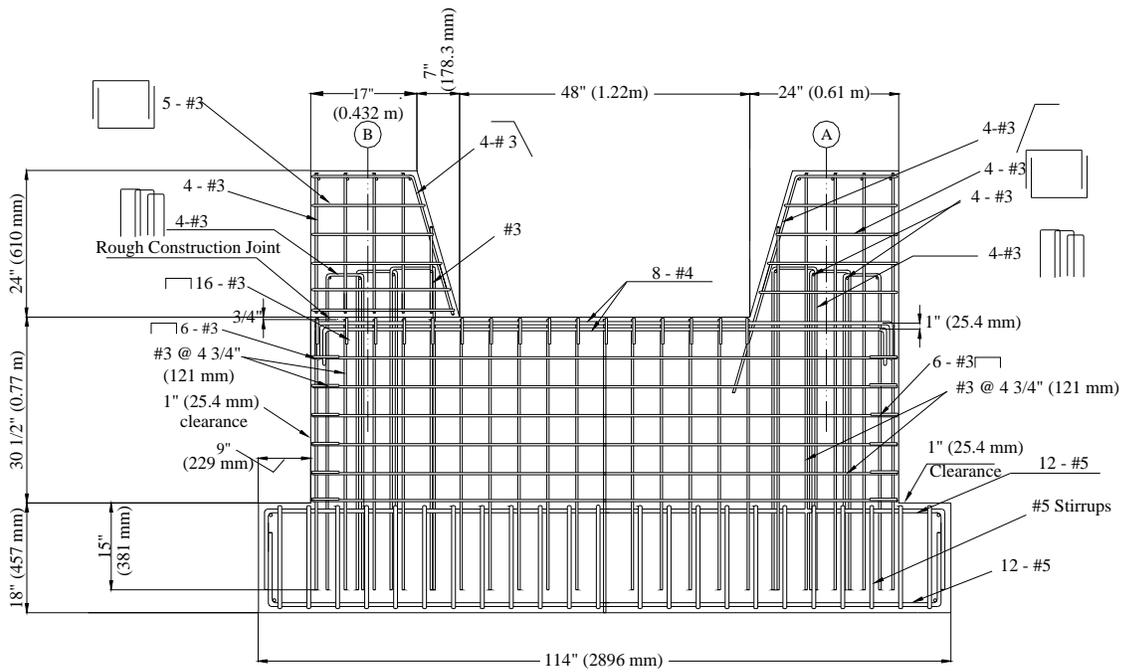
1- Elevation View of the Reinforcement Layout-Test Series IV
